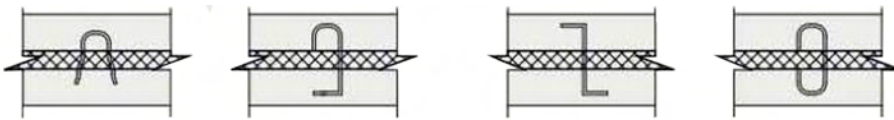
One-way shear connectors, PCI Committee report on Precast/Prestressed Concrete Sandwich Panels (2011)
